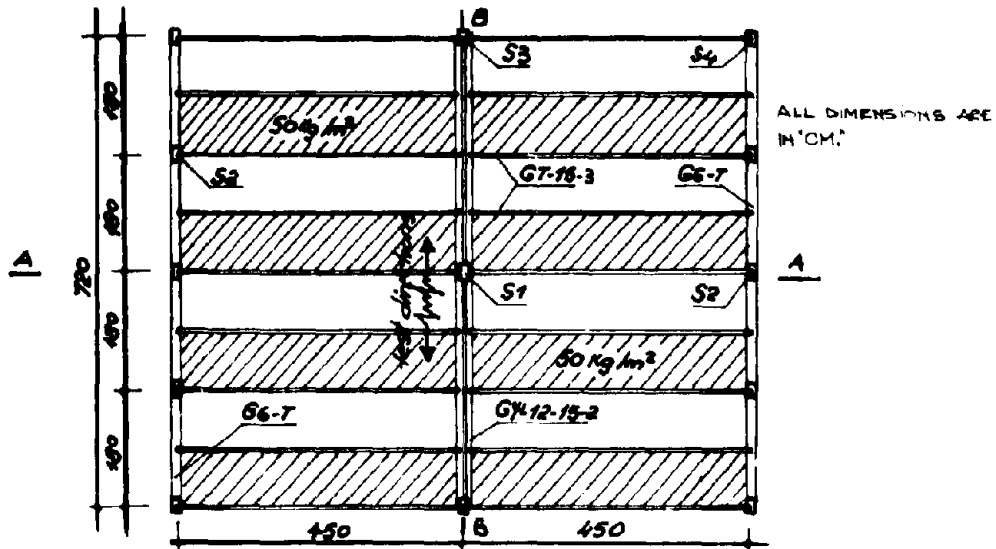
ROOF PLAN, MODEL OF A SINGLE-STORY BUILDING
